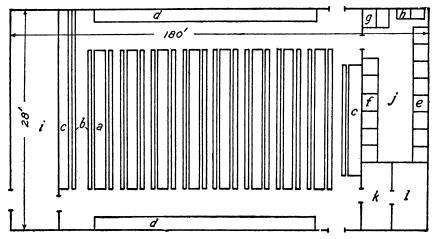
Dryhouse at Hibbing, Minn., Mesabi Range: a, Double row of lockers; b, benches; c, lockers; d, wash trough; e, 8 latrine stalls; f, 6 showers; g, 2 urinals; h, 2 laundry tubs; i, boiler rooms; j, shower and latrine room; k, shift boss's room; l, captain's room.
